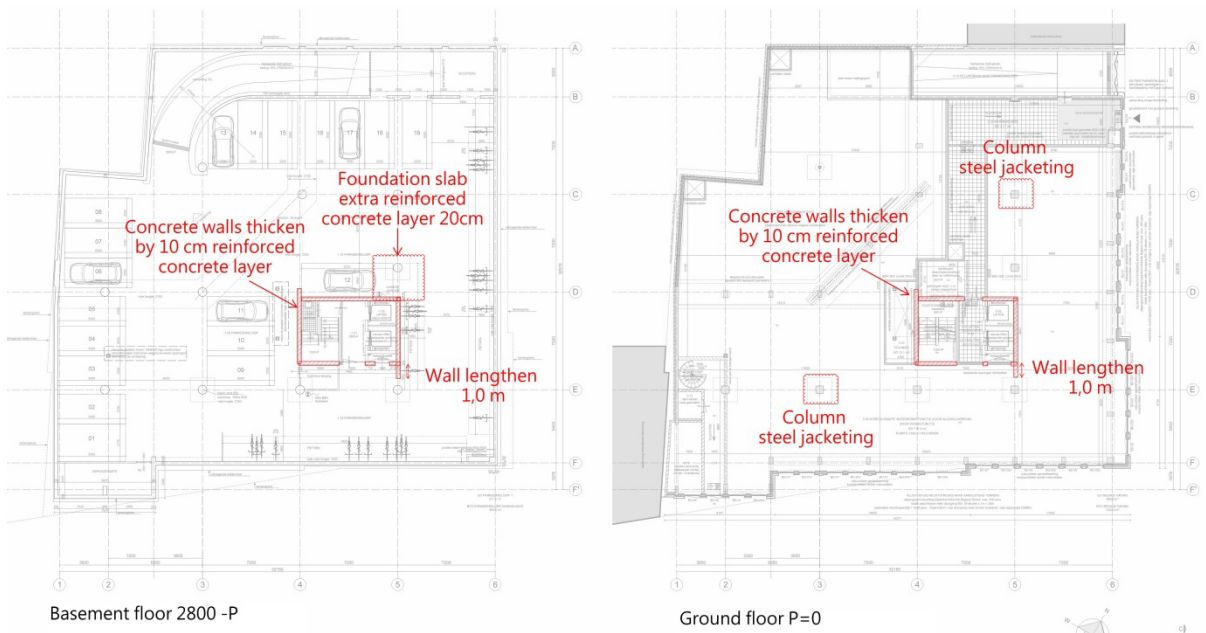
Strengthening measures on basement and ground floor - Scenario 3
